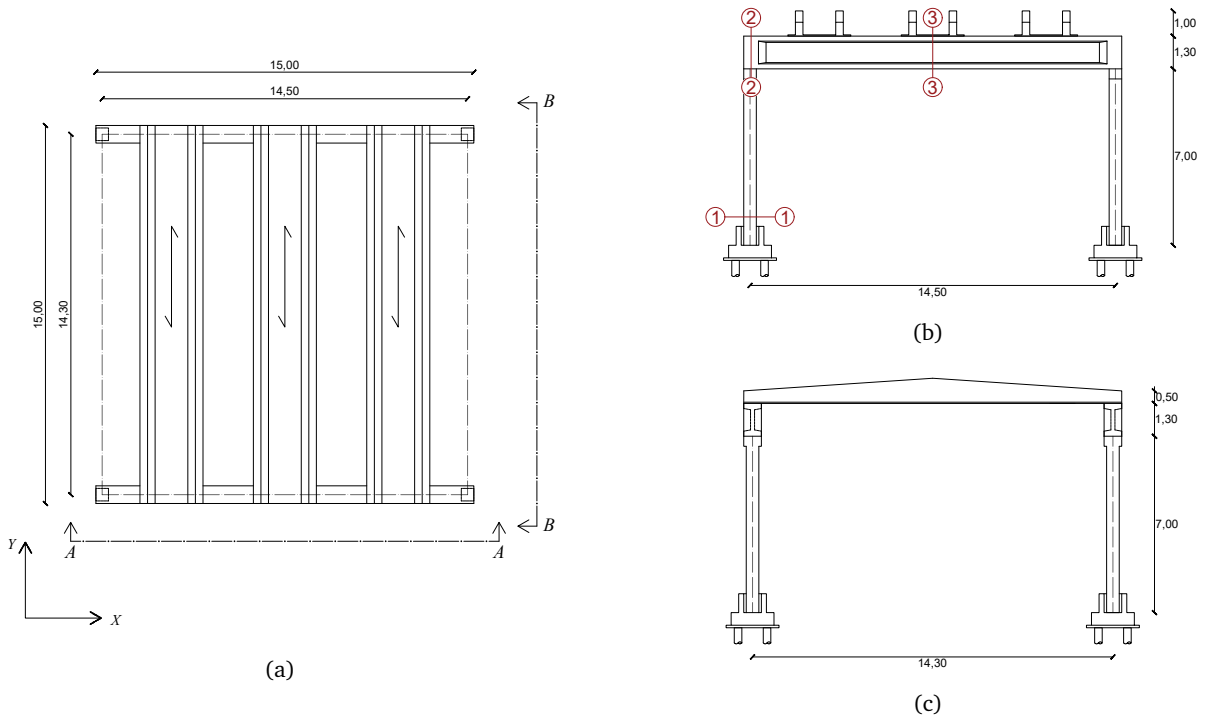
Precast RC structure used as a case study: a) top view, b) A-A view and c) B-B view. Dimensions in m.
